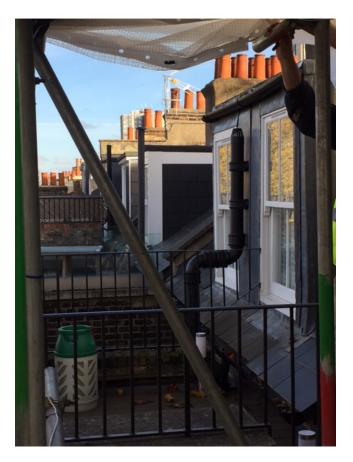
(above): Existing rear dormer at adjacent neighbour No. 144 Fellows Road and view of existing rear dormers to east
